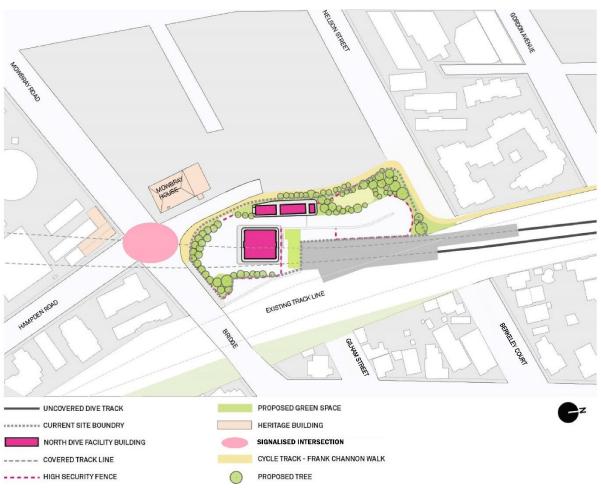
Chatswood Dive Precinct Plan - Site Adjacencies
